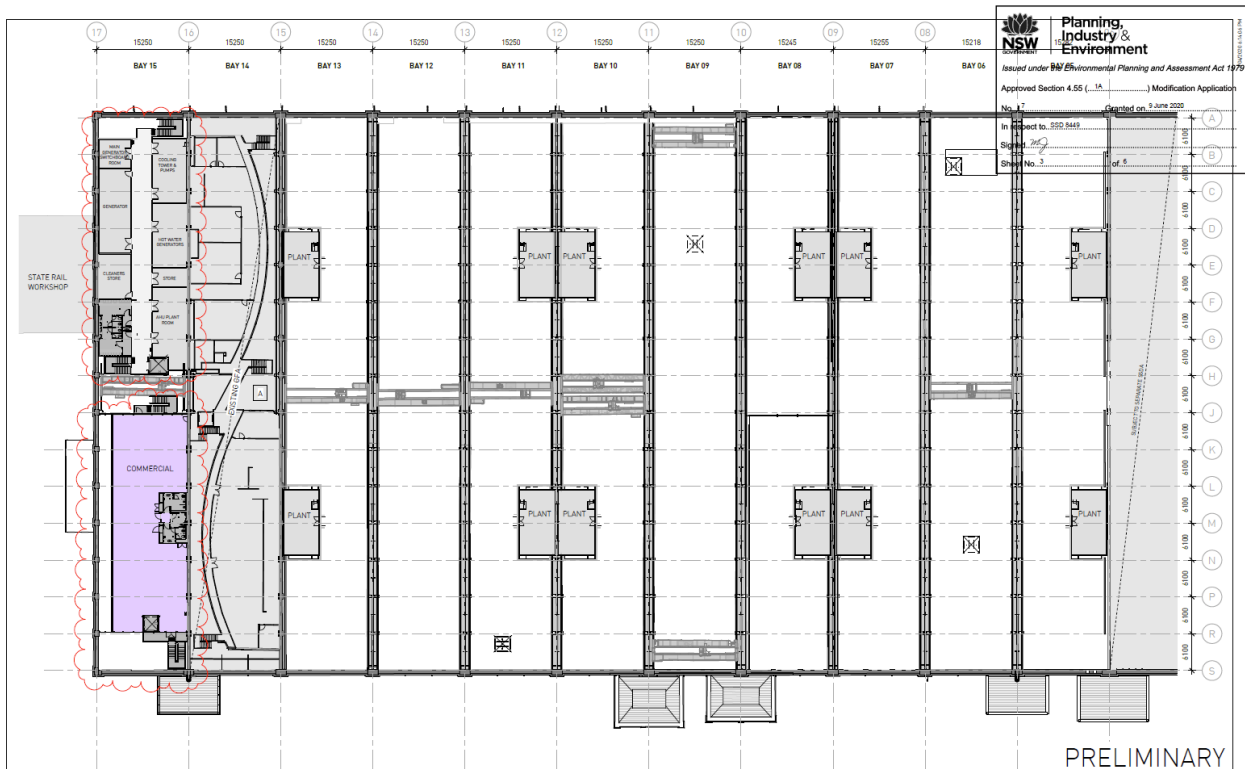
Last Approved Second Floor Plan – Bay 15
